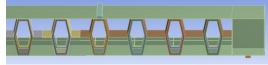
Beam model with Hexagonal folded web plate of two stiffeners one interior and one exterior
